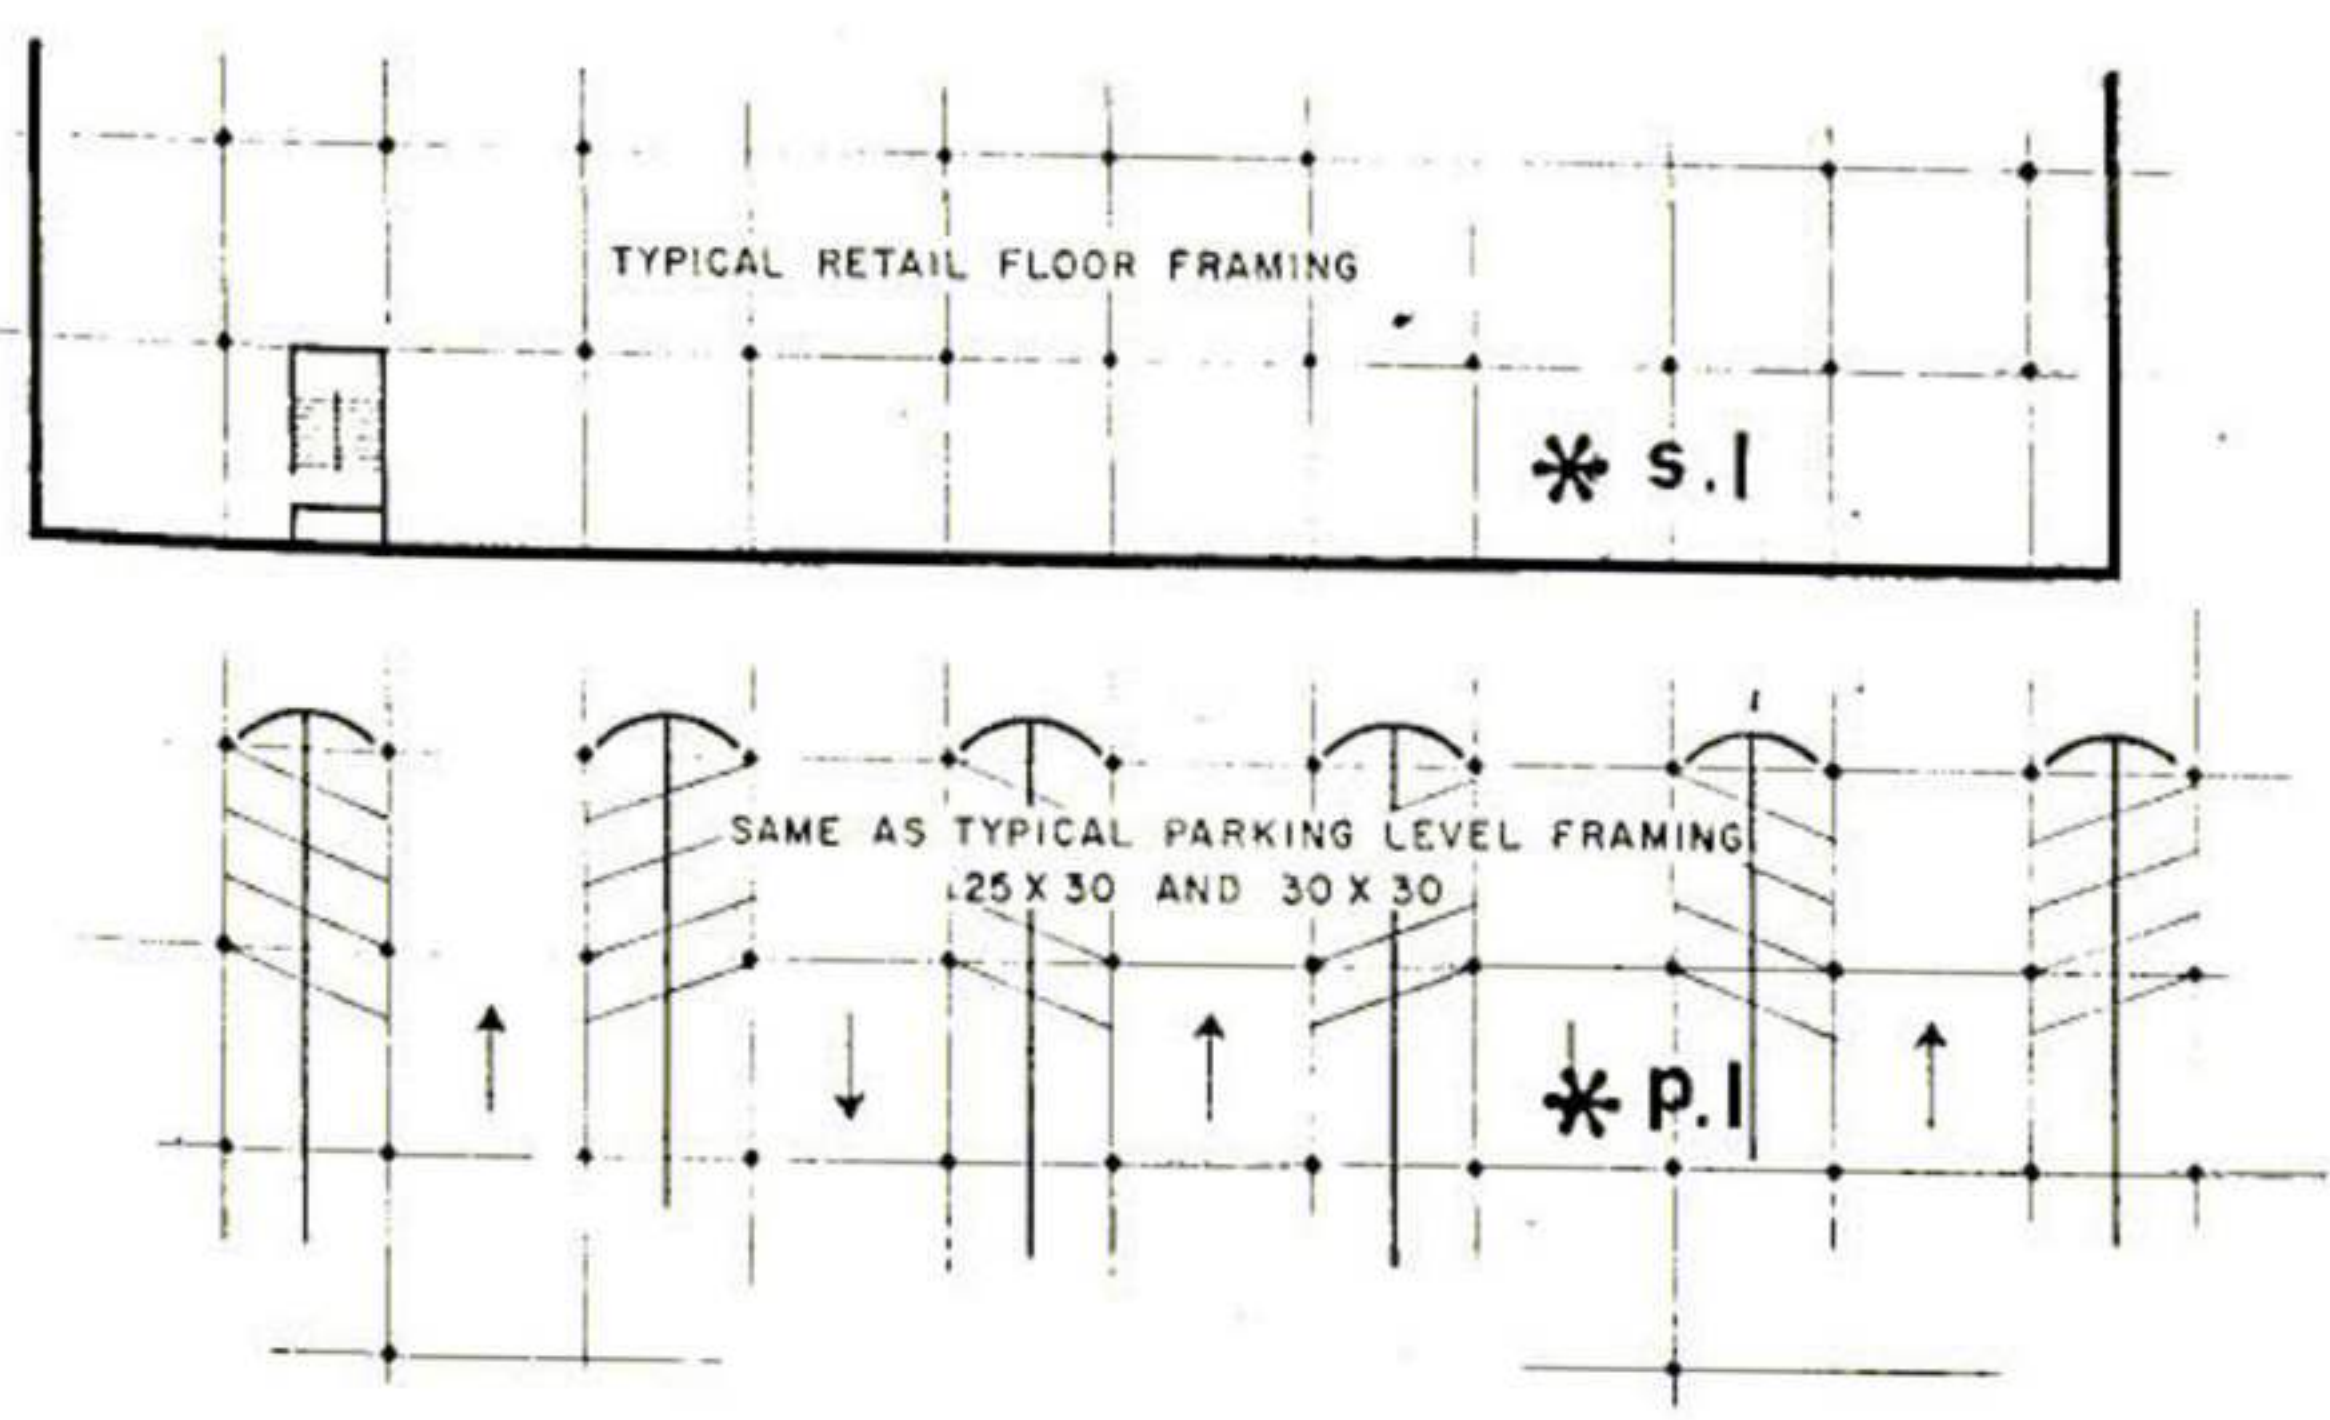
Section. Westchester Terminal Plaza. Partial plan of typical retail floor and typical parking level showing identical column spacing as utilized in both cases.
